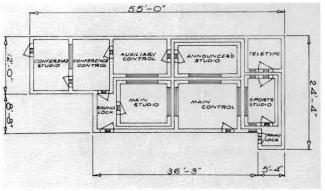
Layout of studios and control at AFRTS-Washington. The complete soundproof studio rooms including walls, floor, ceilings and doors were constructed with the IAC Moduline® component system of acoustic structures.
